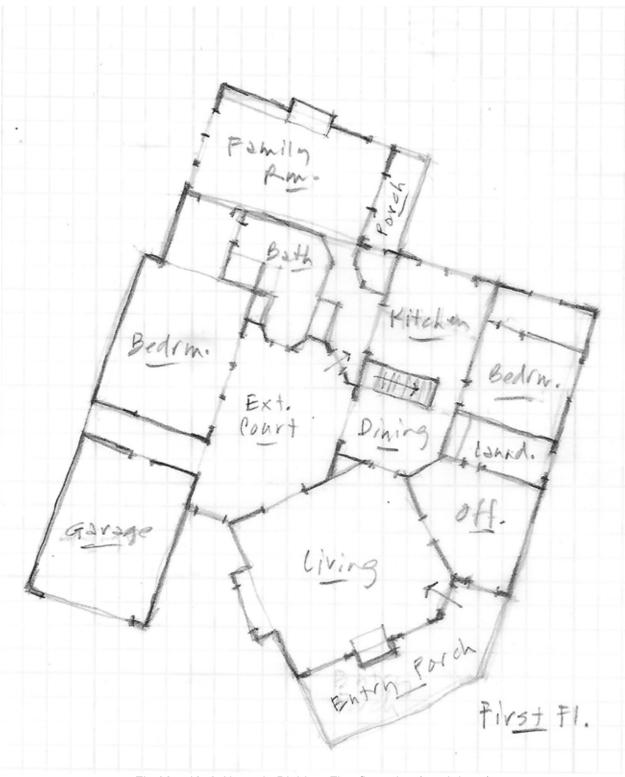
1850 Alameda Diablo – First floor plan (south is up)
